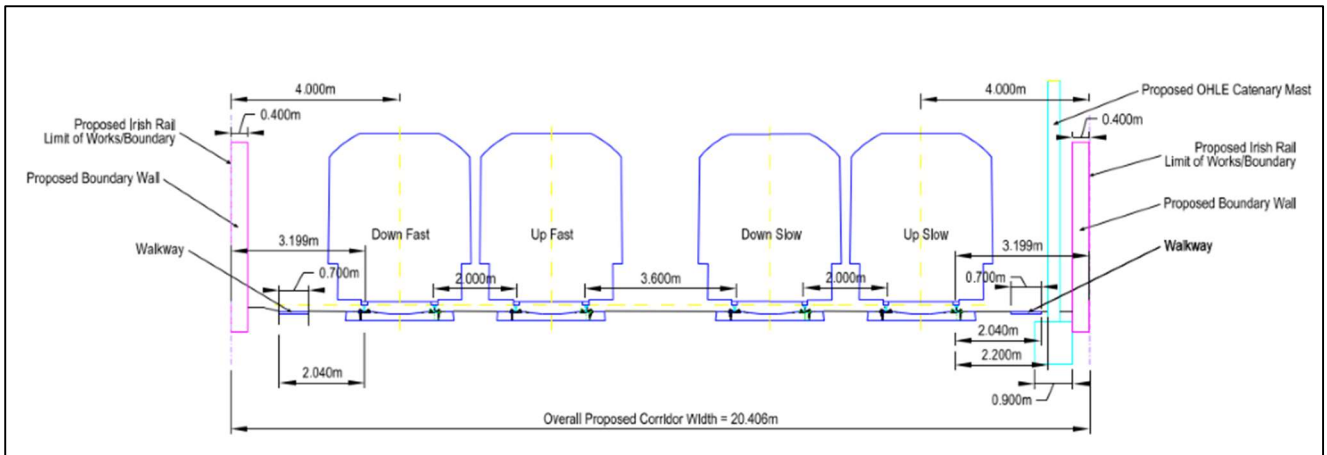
Minimum distance from property boundary to nearest track – West Facing
